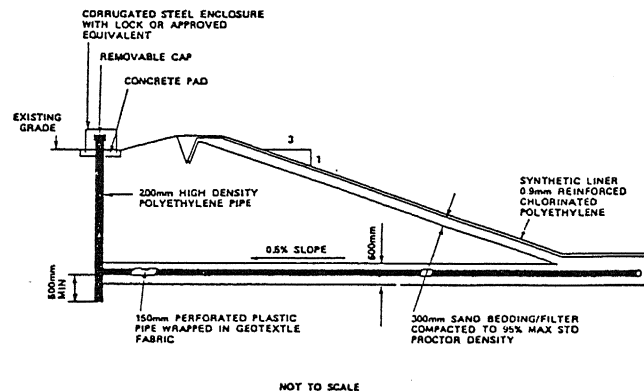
shows the details of the liner installation system. Below this liner a 300mm sand bedding was placed both on the sides and at the bottom of the pond. A gravel-filled trench was also placed at the pond bottom along its centerline. A 150mm perforated drain pipe wrapped in woven filter fabric was placed at the bottom of the trench. This perforated-drain pipe was sloped towards the pond center and connected to a 200mm sump through a pipe. This under-drainage system was installed to serve two purposes: The first purpose was to relieve about 4m of groundwater pressure at the pond base below the liner. This became important because the pond was required to be operated often at low levels. Thus the groundwater pressures could be relieved by pumping from the sump before lowering the water level in the pond. The second purpose of this under-drainage system was to periodically collect water samples for laboratory testing to detect any contaminant leakage from the process waste water pond.
